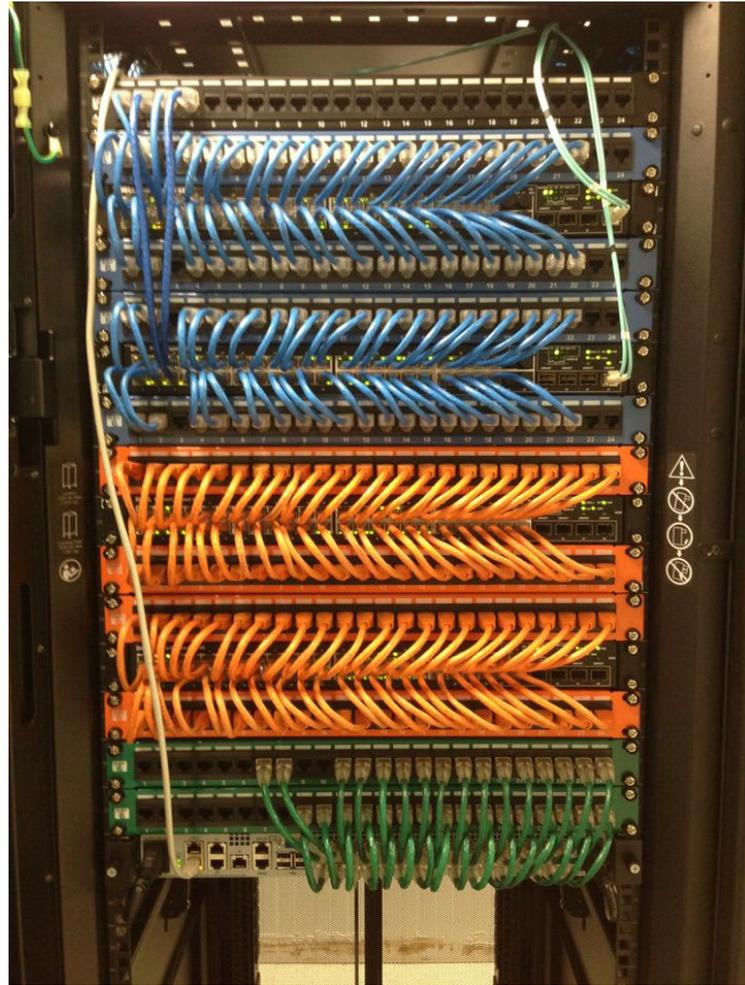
Cabinet layout after patching with 1 ft. patch leads, showing groups of two 1U 24-port Cat.6A keystone type patch panels, located above and below a 48 port PoE switch. Note the dressing of the infrastructure cables to facilitate the switch installation.
